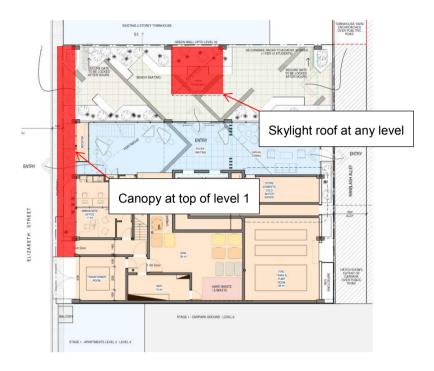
Ground floor plan of the proposed development with the recommended wind control measures overlaid
